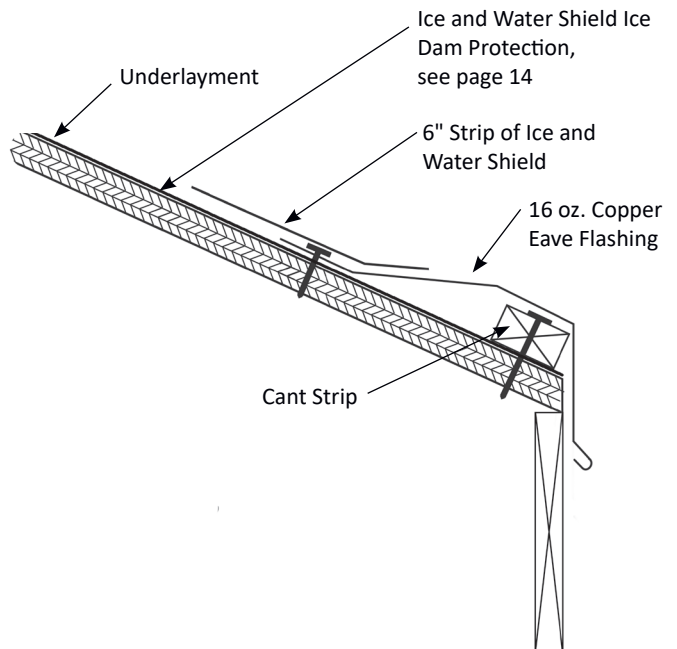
Copper Flashing Eave Detail for LudoSlate™ and LudoShake™
